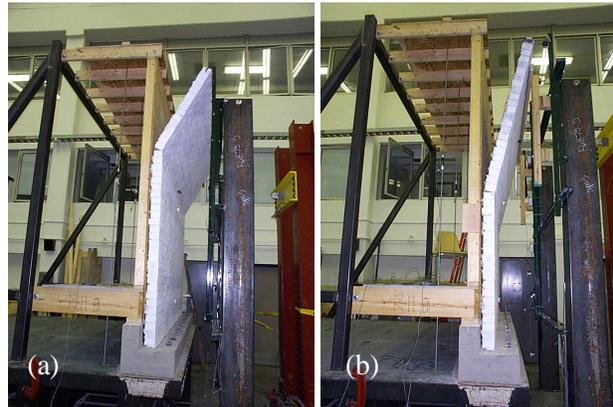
Collapse of the brick veneer in (a) Wall-1 and (b) Wall-2.
